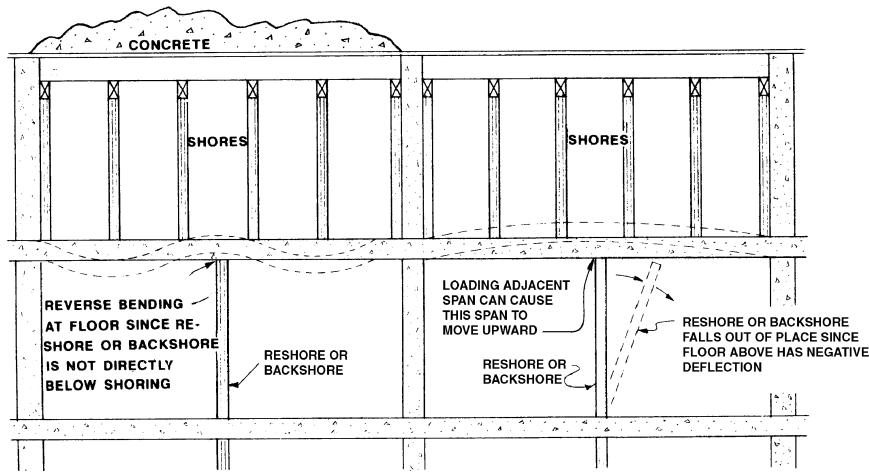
Reshore installation. Improper positioning of shore from floor to floor can create bending stresses for which the slab was not designed.
